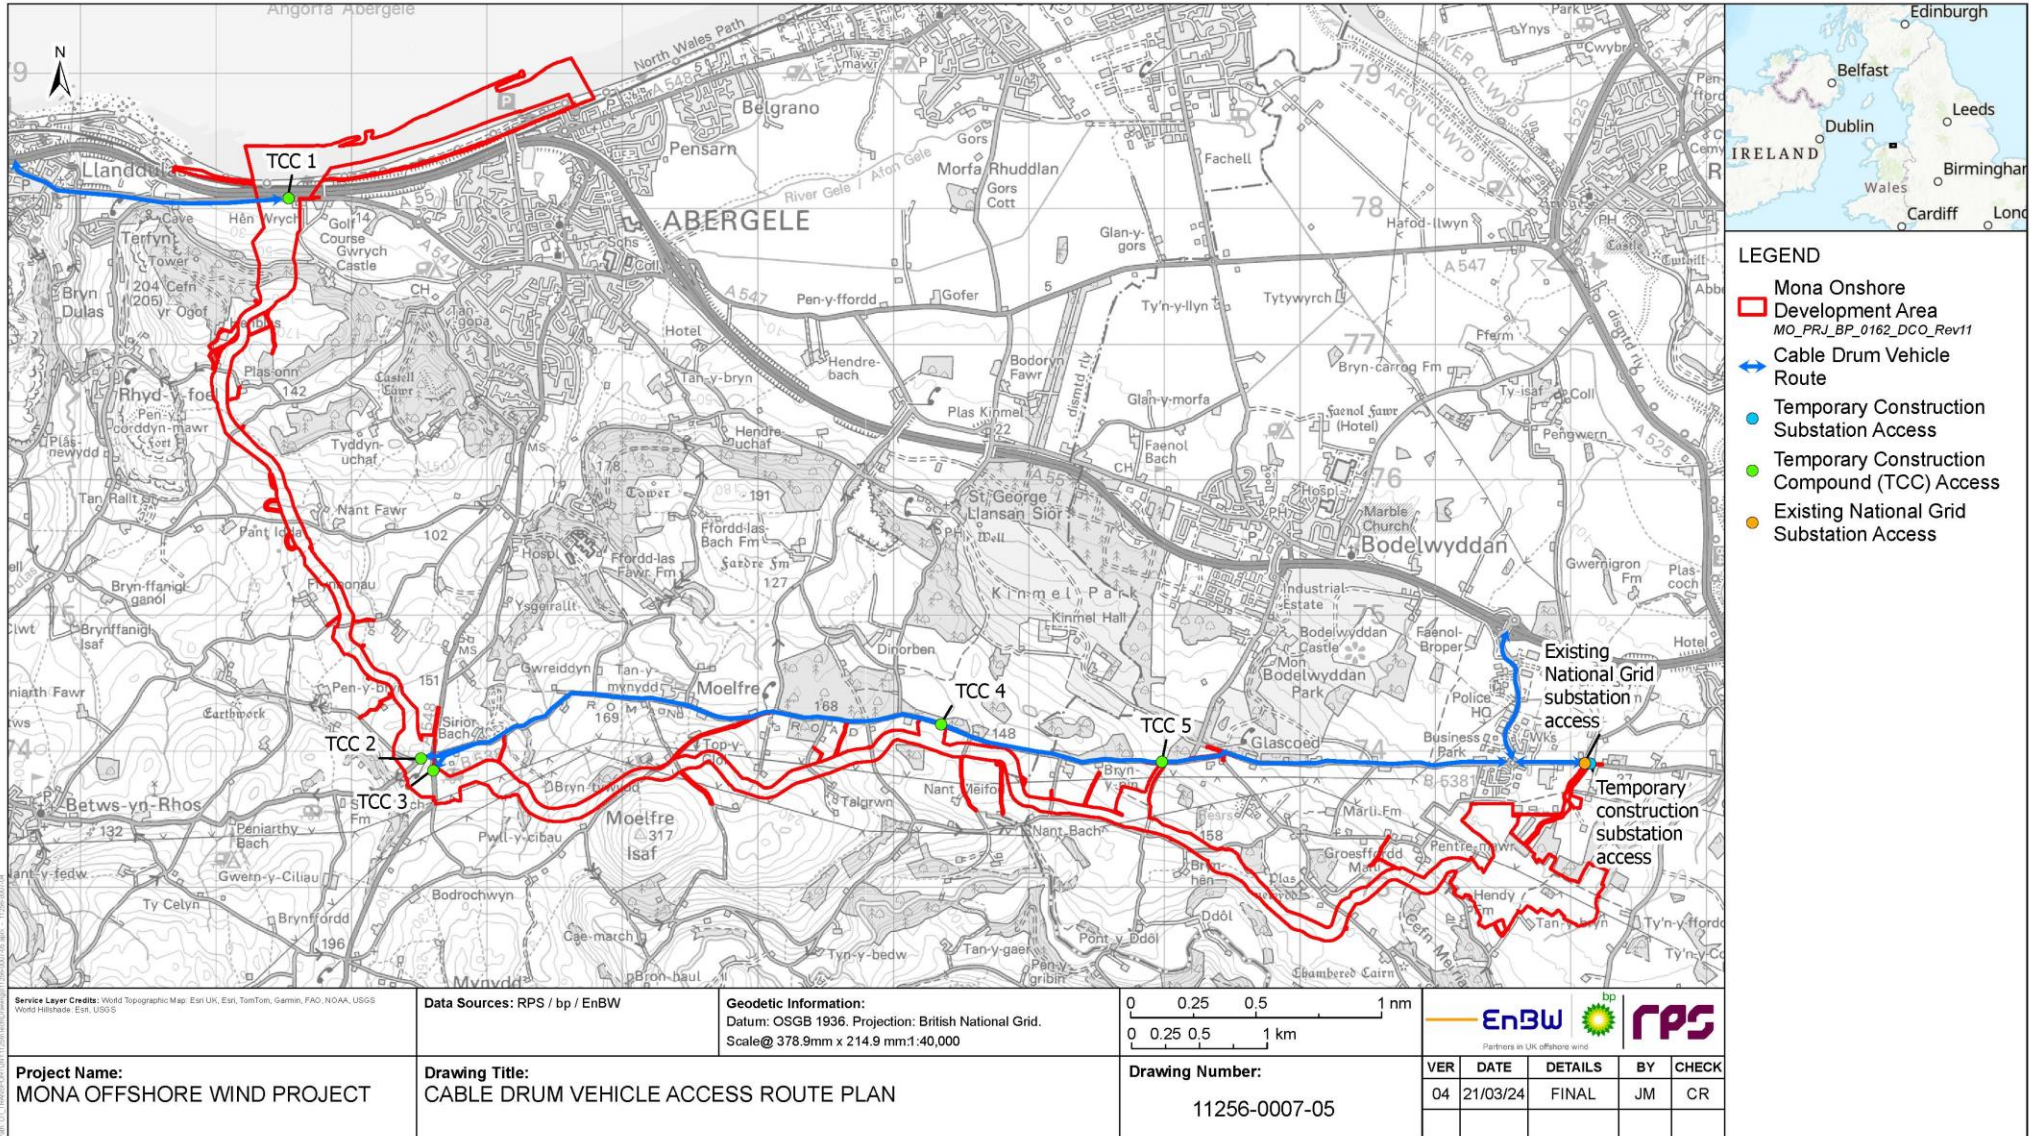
Appendix B of the Outline Construction Traffic Management Plan (APP-225).
